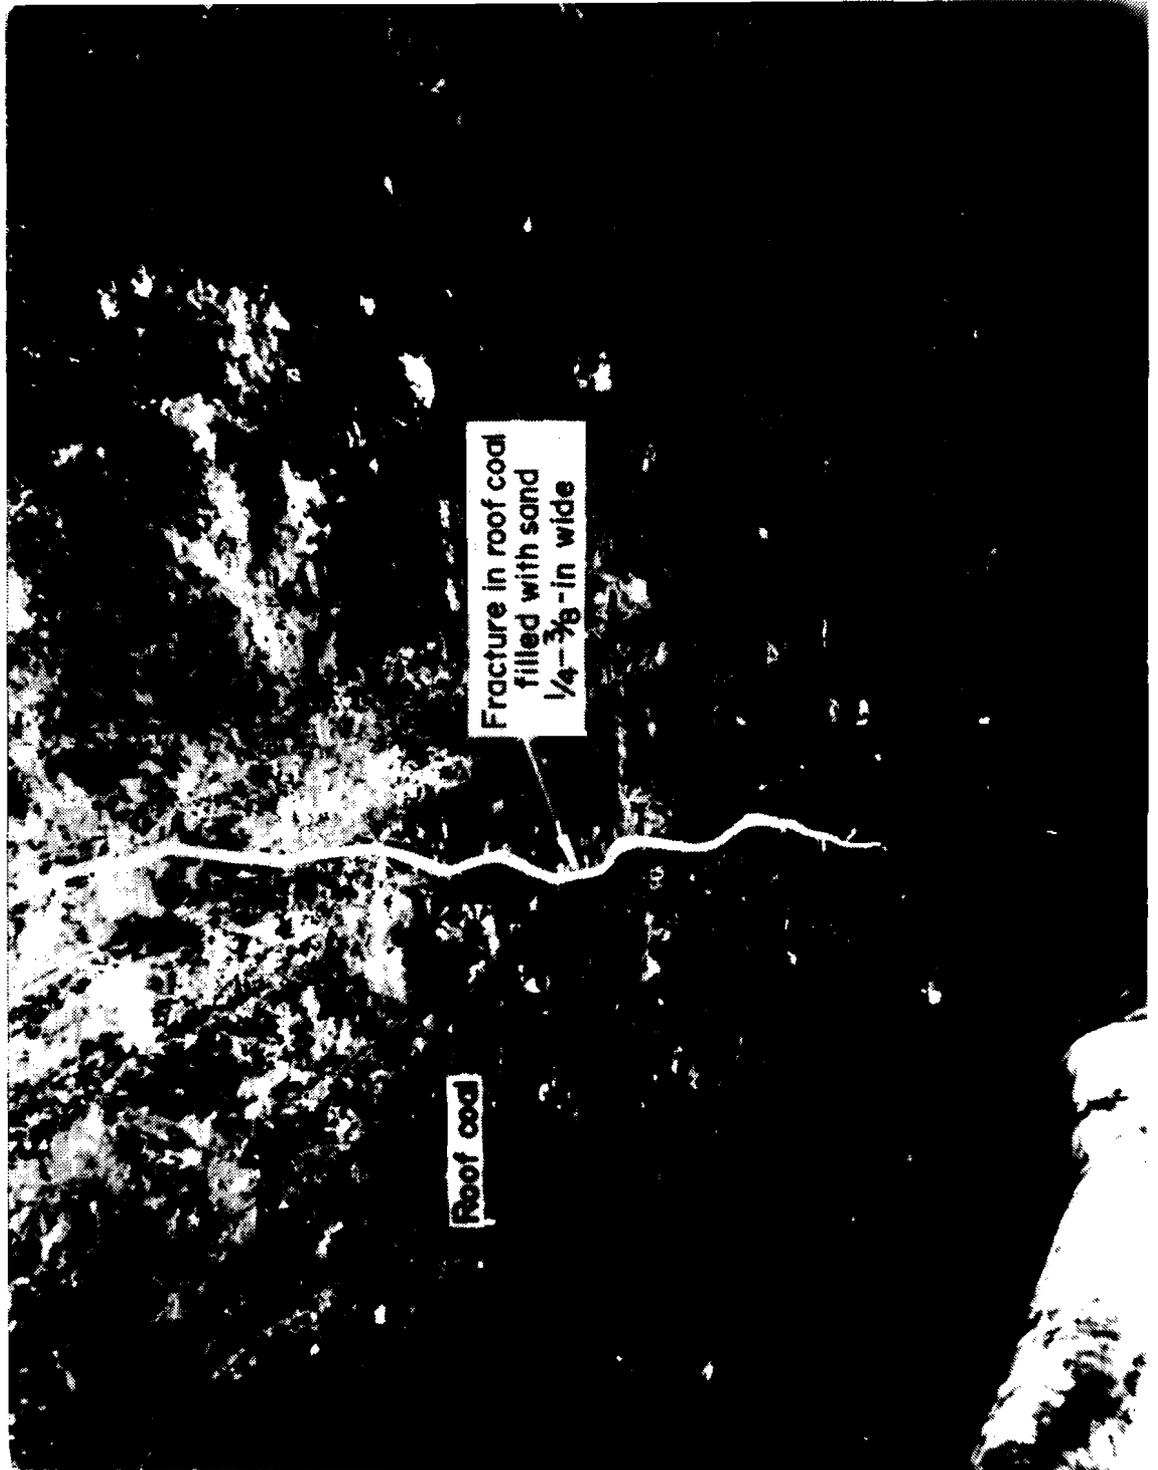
DETAIL OF INDUCED FRACTURES IN ROOF
